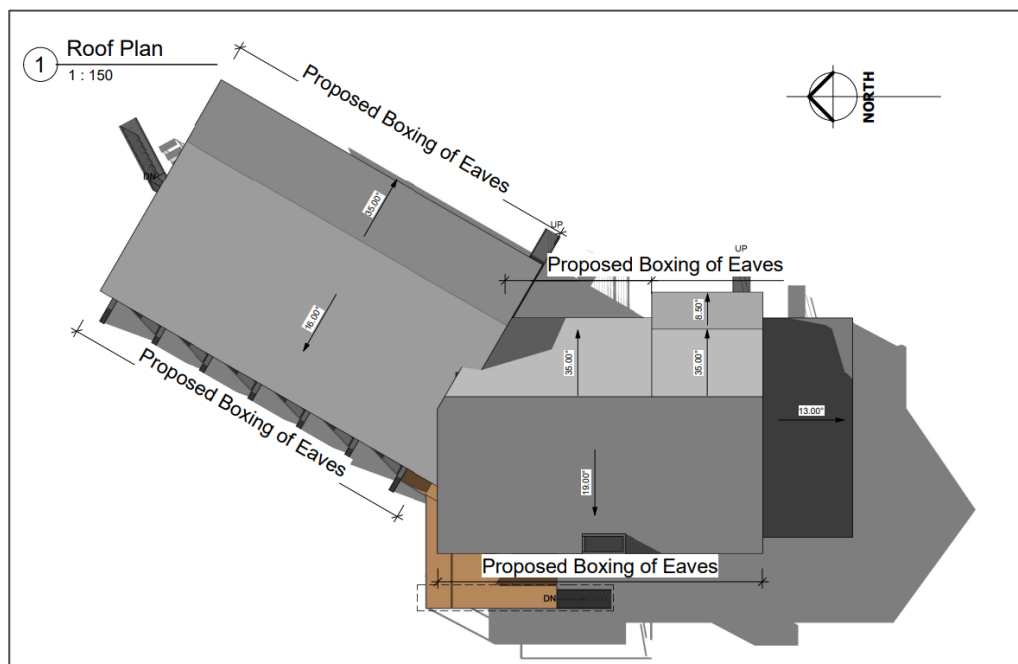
| Altitude Lodge roof plan and boxing in eaves (Source: Applicant's documentation)
